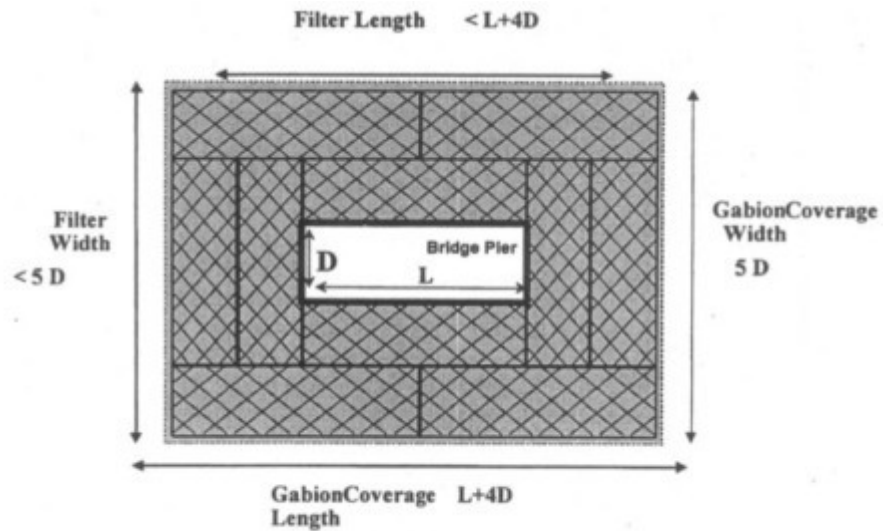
Extent of Gabions and Geotextile Filter around Bridge Piers.
